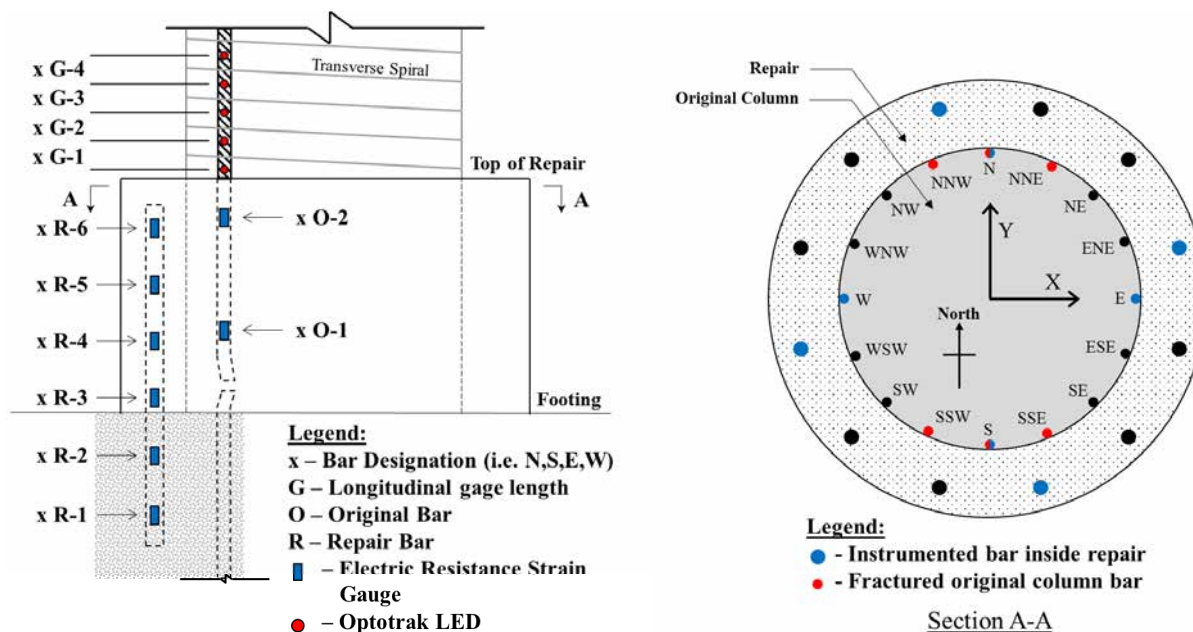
Repair #6 Instrumentation labels and repair cross section layout.
